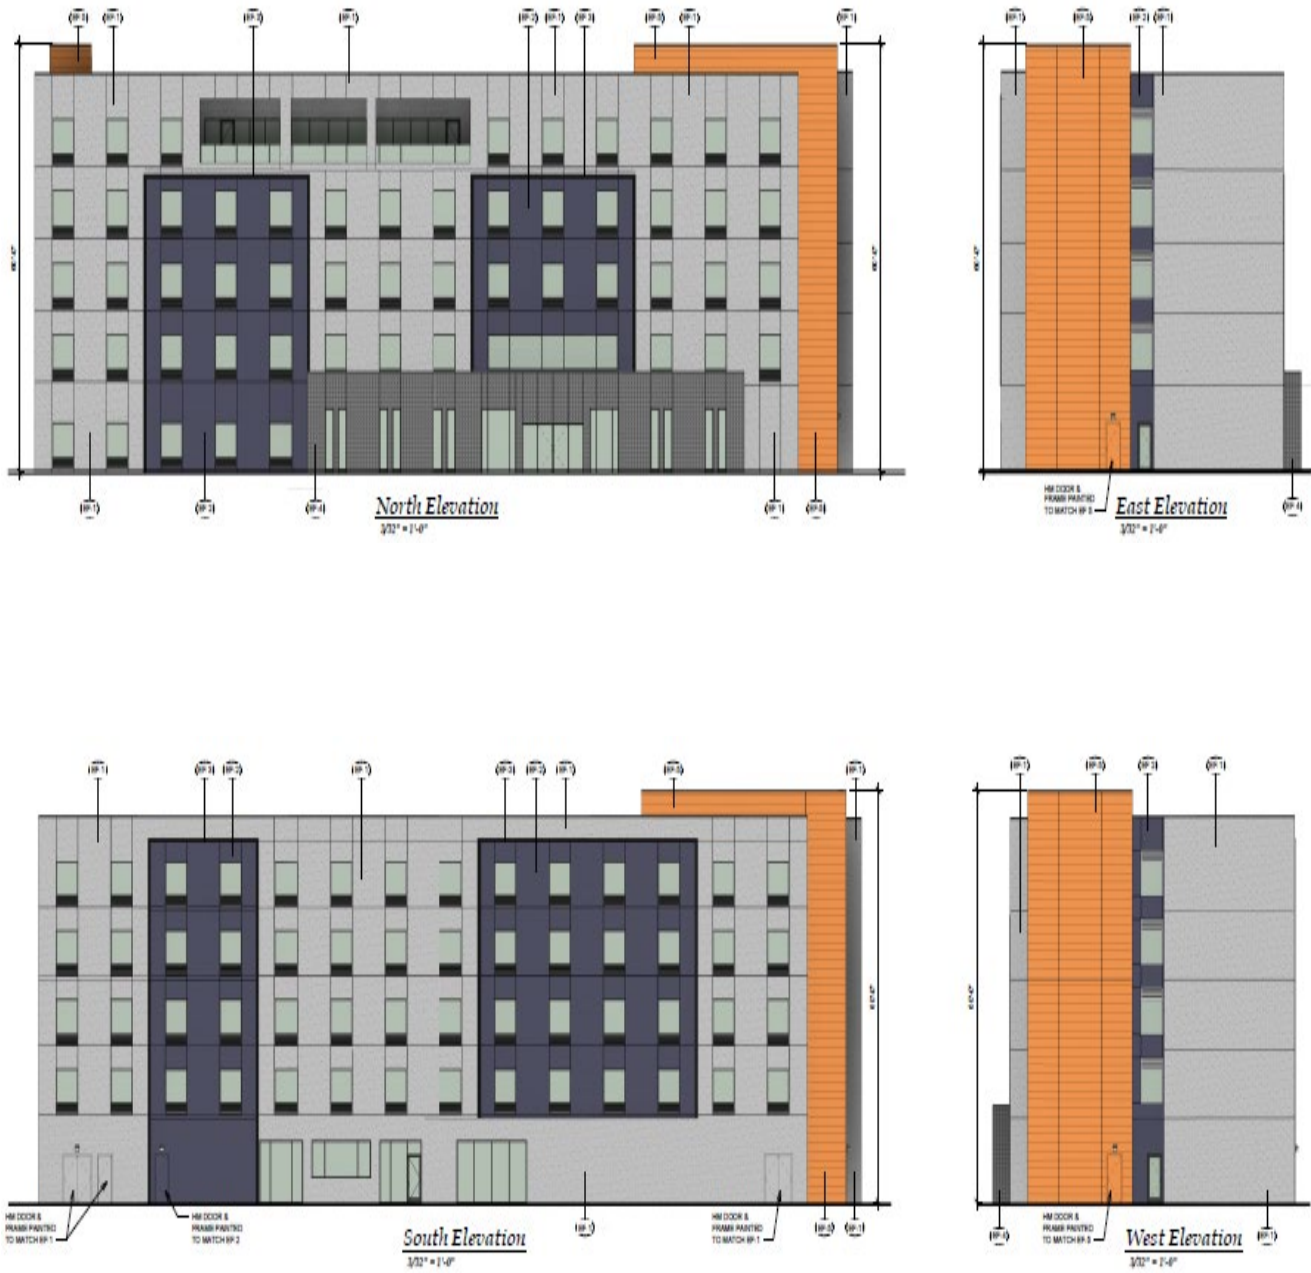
CONCEPTUAL BUILDING ELEVATIONS
